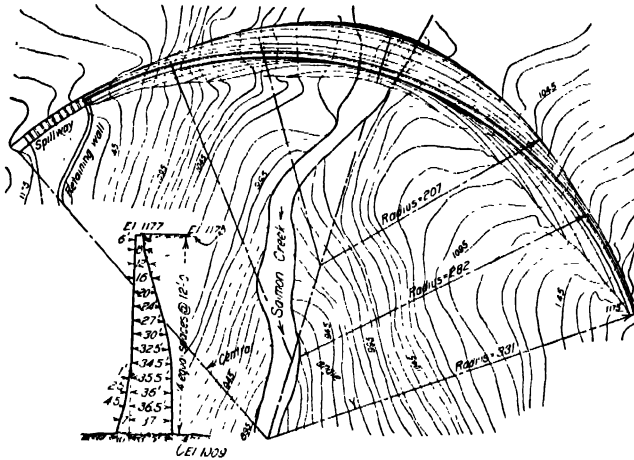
Typical constant angle arch dam. 168-ft. dam for Salmon Creek, Alaska.
